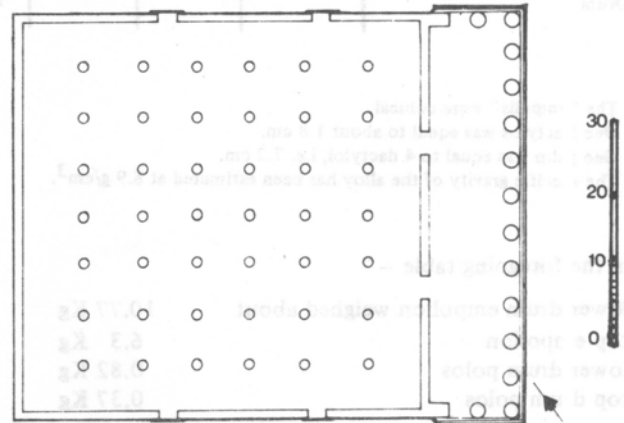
Plan of the Telestirion and the 14 columns of the Philonian Stoa (after J N Travlos)
